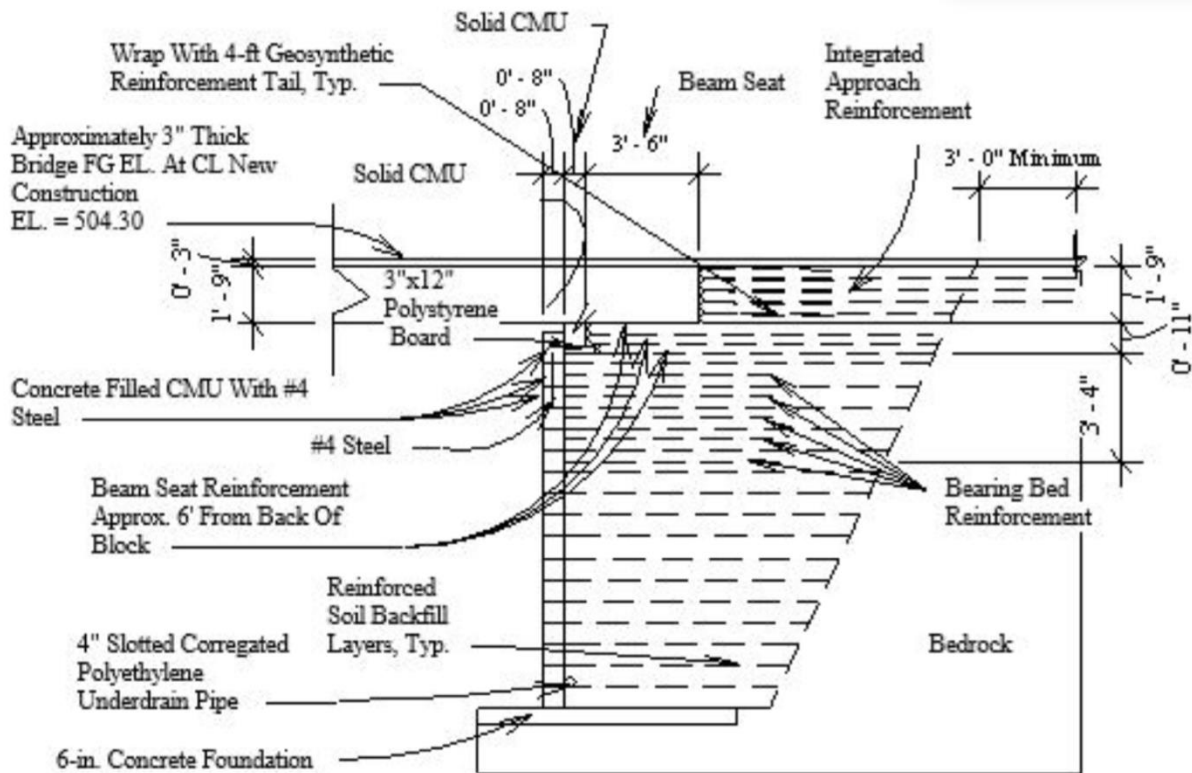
Design plan using truncated reinforcement (from ALDOT 2017)
